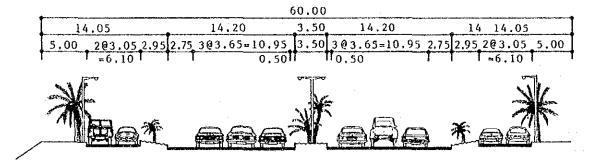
TYPICAL CROSS SECTION OF CORREDOR SUR (RIO ABAJO I.C.-VIA CIUDAD RADIAL)
